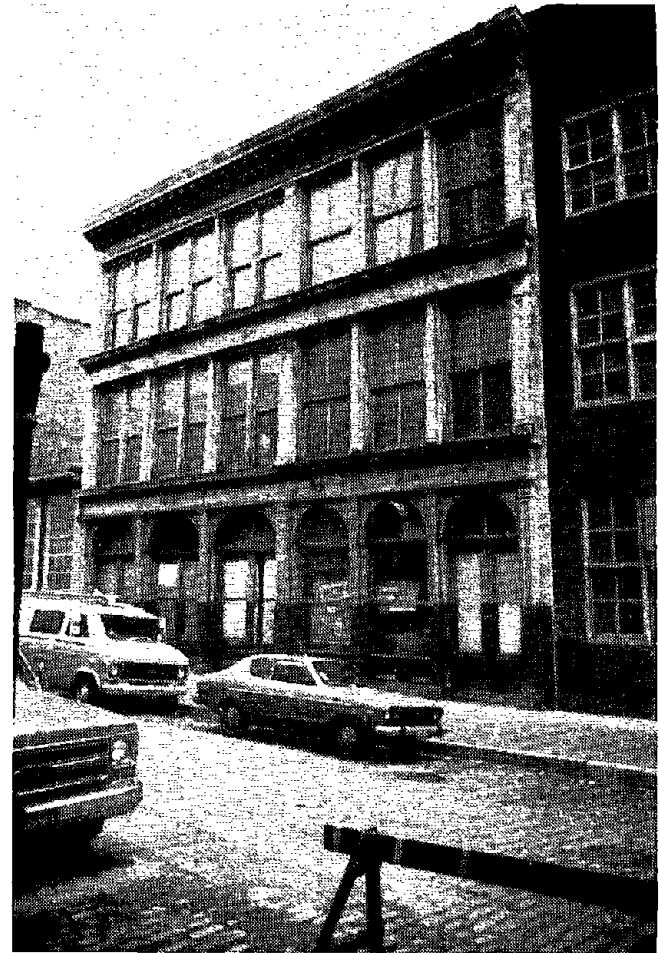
URM COMMERCIAL BUILDING WITH MULTI-STORY CAST IRON FRAMING ST. LOUIS, MO.
